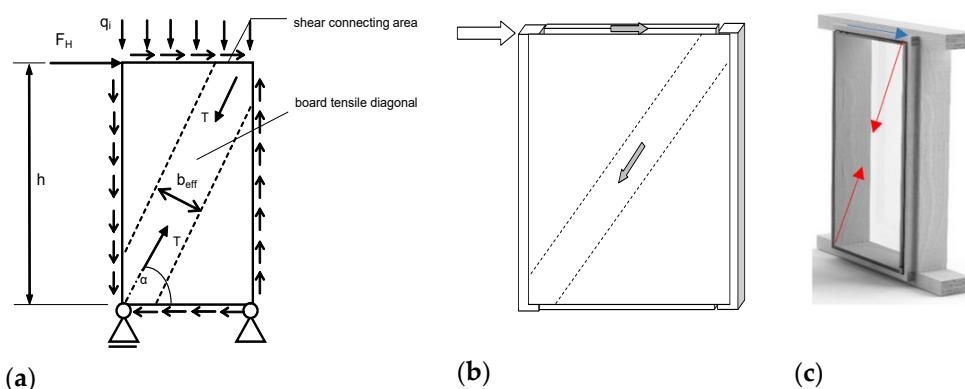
(a) Horizontal point load distribution in timber-framed wall element; (b) timber-framed wall with a conventional sheathing board; (c) timber–glass resisting wall element for a horizontal load impact (shear force (blue arrow), tensile diagonal force (red arrow)) [16].
